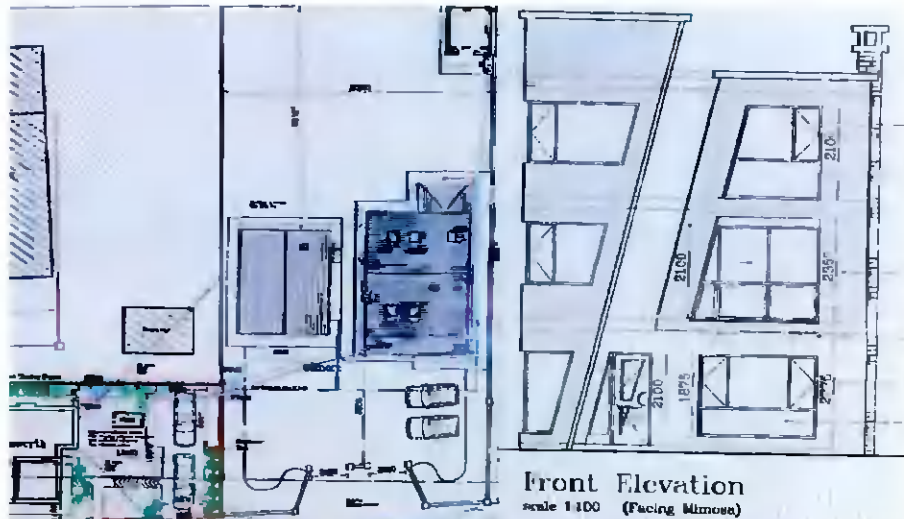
The proposed rear ("front") elevation to face the permitted dwellings to the east
